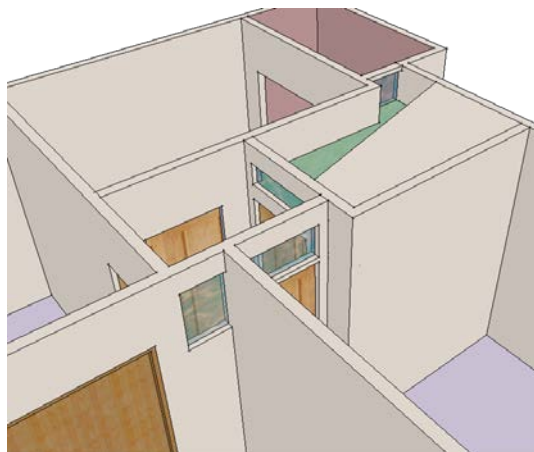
Three-dimensional detail representation of the apartment showing the new hallway openings for the ‘internal openings’ ventilation strategy
